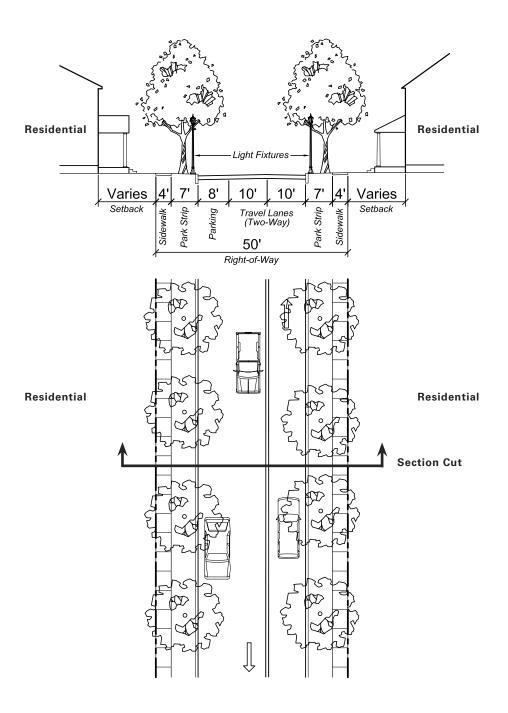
Proposed Section and Plan: Neighborhood Street B
